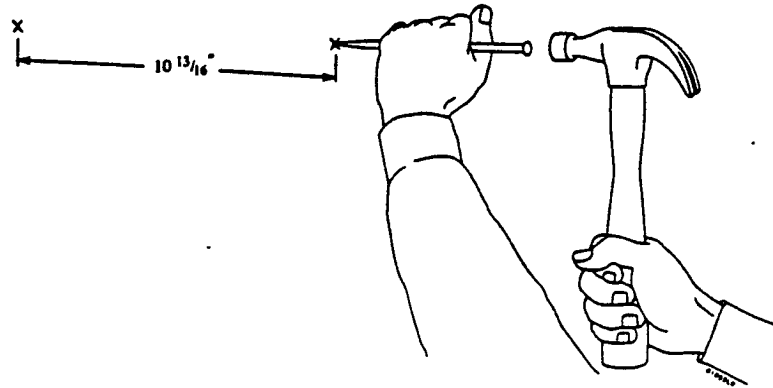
LOCATING THE CEU MOUNTING HOLES
